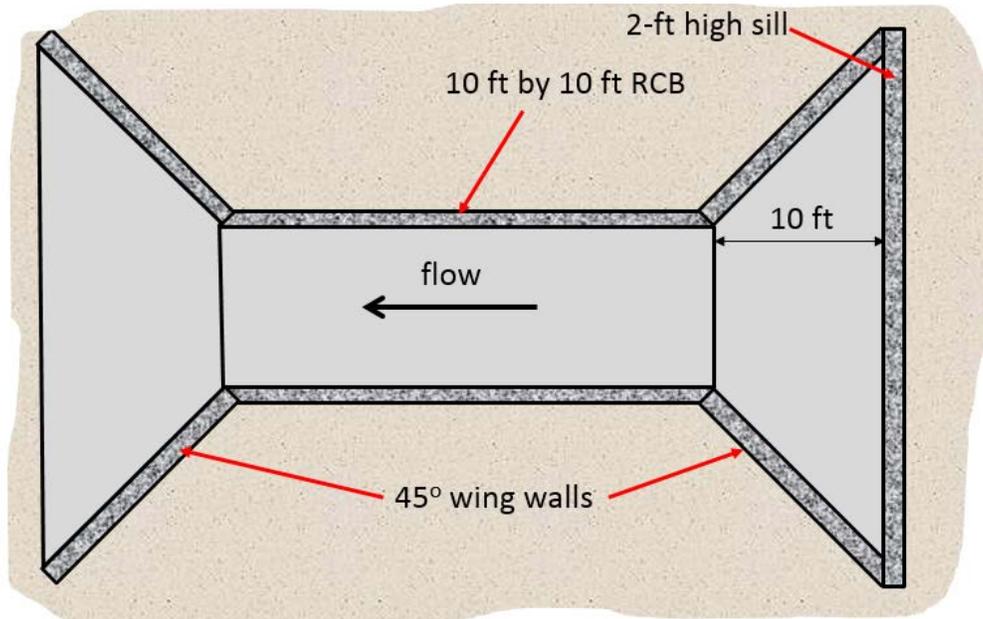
Sketch of Model Culvert with Soil Saver Wall at the Upstream End
